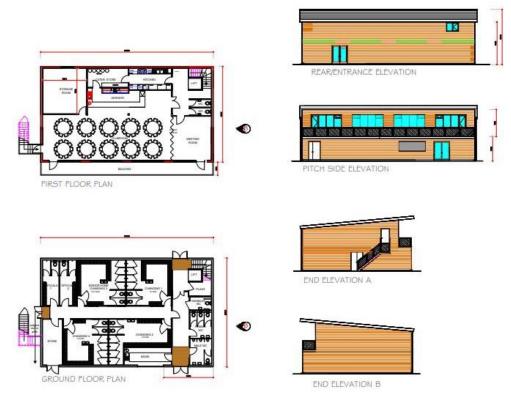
Proposed pavilion floor plan and elevations – previously refused application (21/05790/FULL1).
